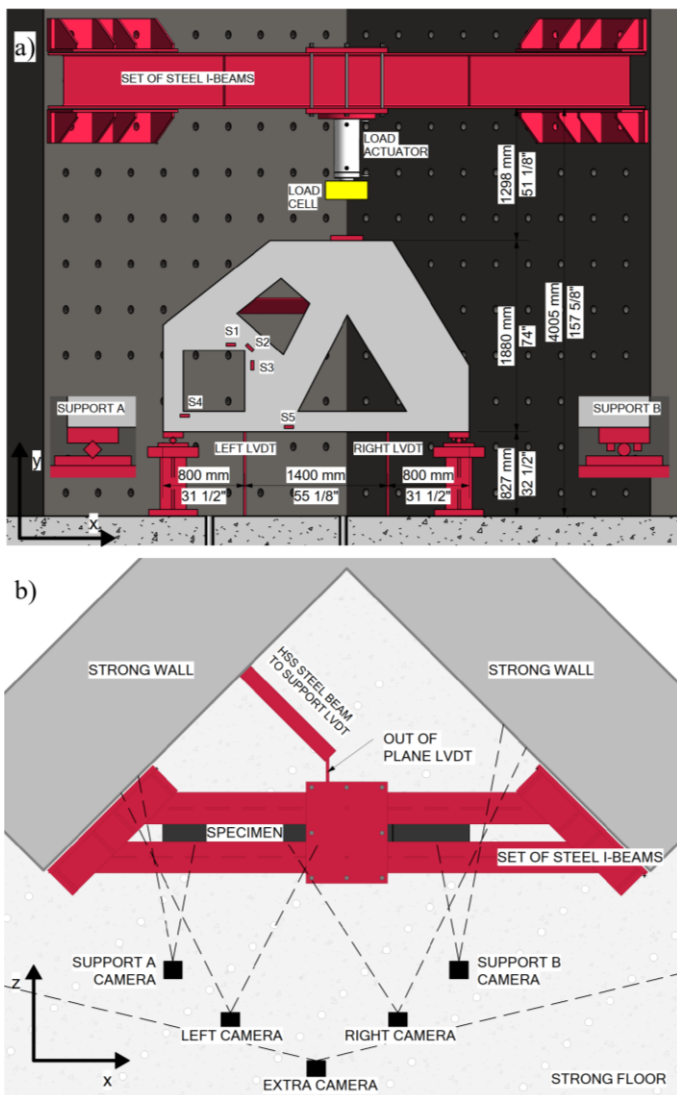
Test setup scheme: a) elevation, and b) plan view.
